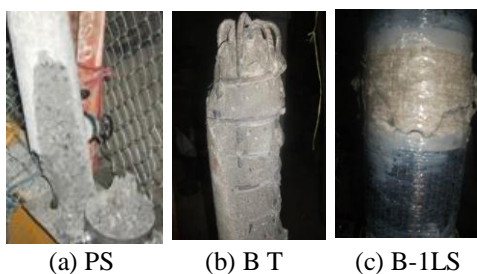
Collapse of Specimen Model PS, BT, and B-1 LS
